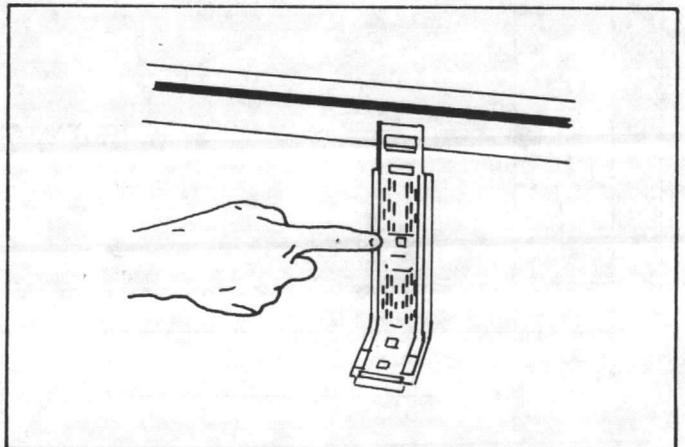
Hole for Fastening Enclosure Bracket to Wall
